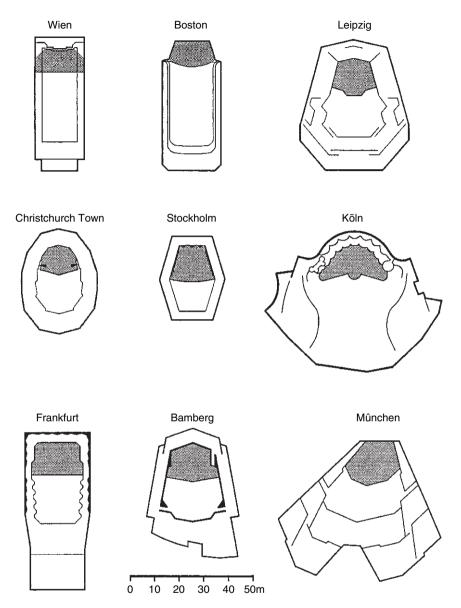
Floor plans of several concert halls. The shaded areas identify the stage
